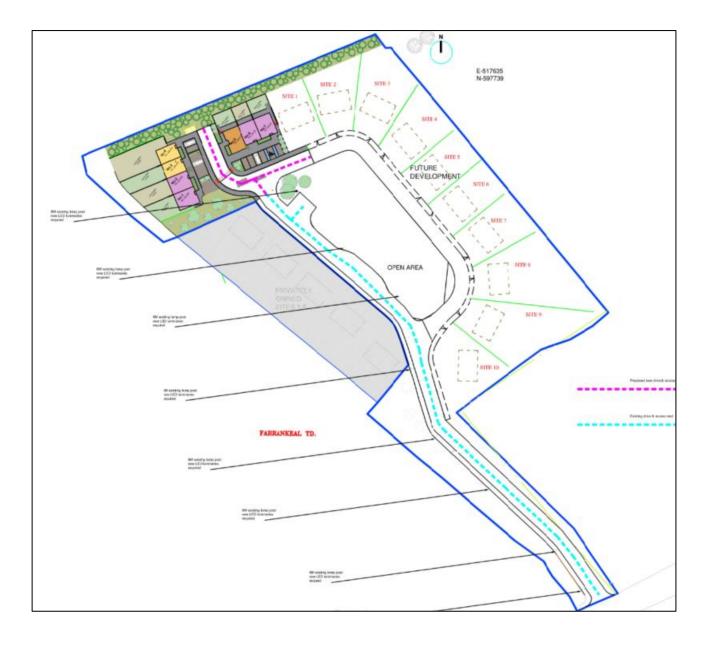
Proposed site plan (DR-CCC-A-SK-101)
